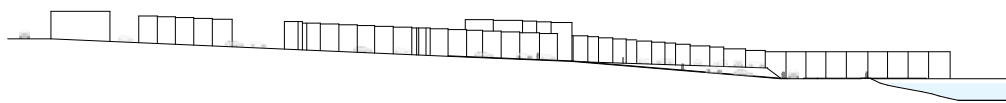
Existing Site Section through Harvard Street from Georgia Ave to Reservoir
